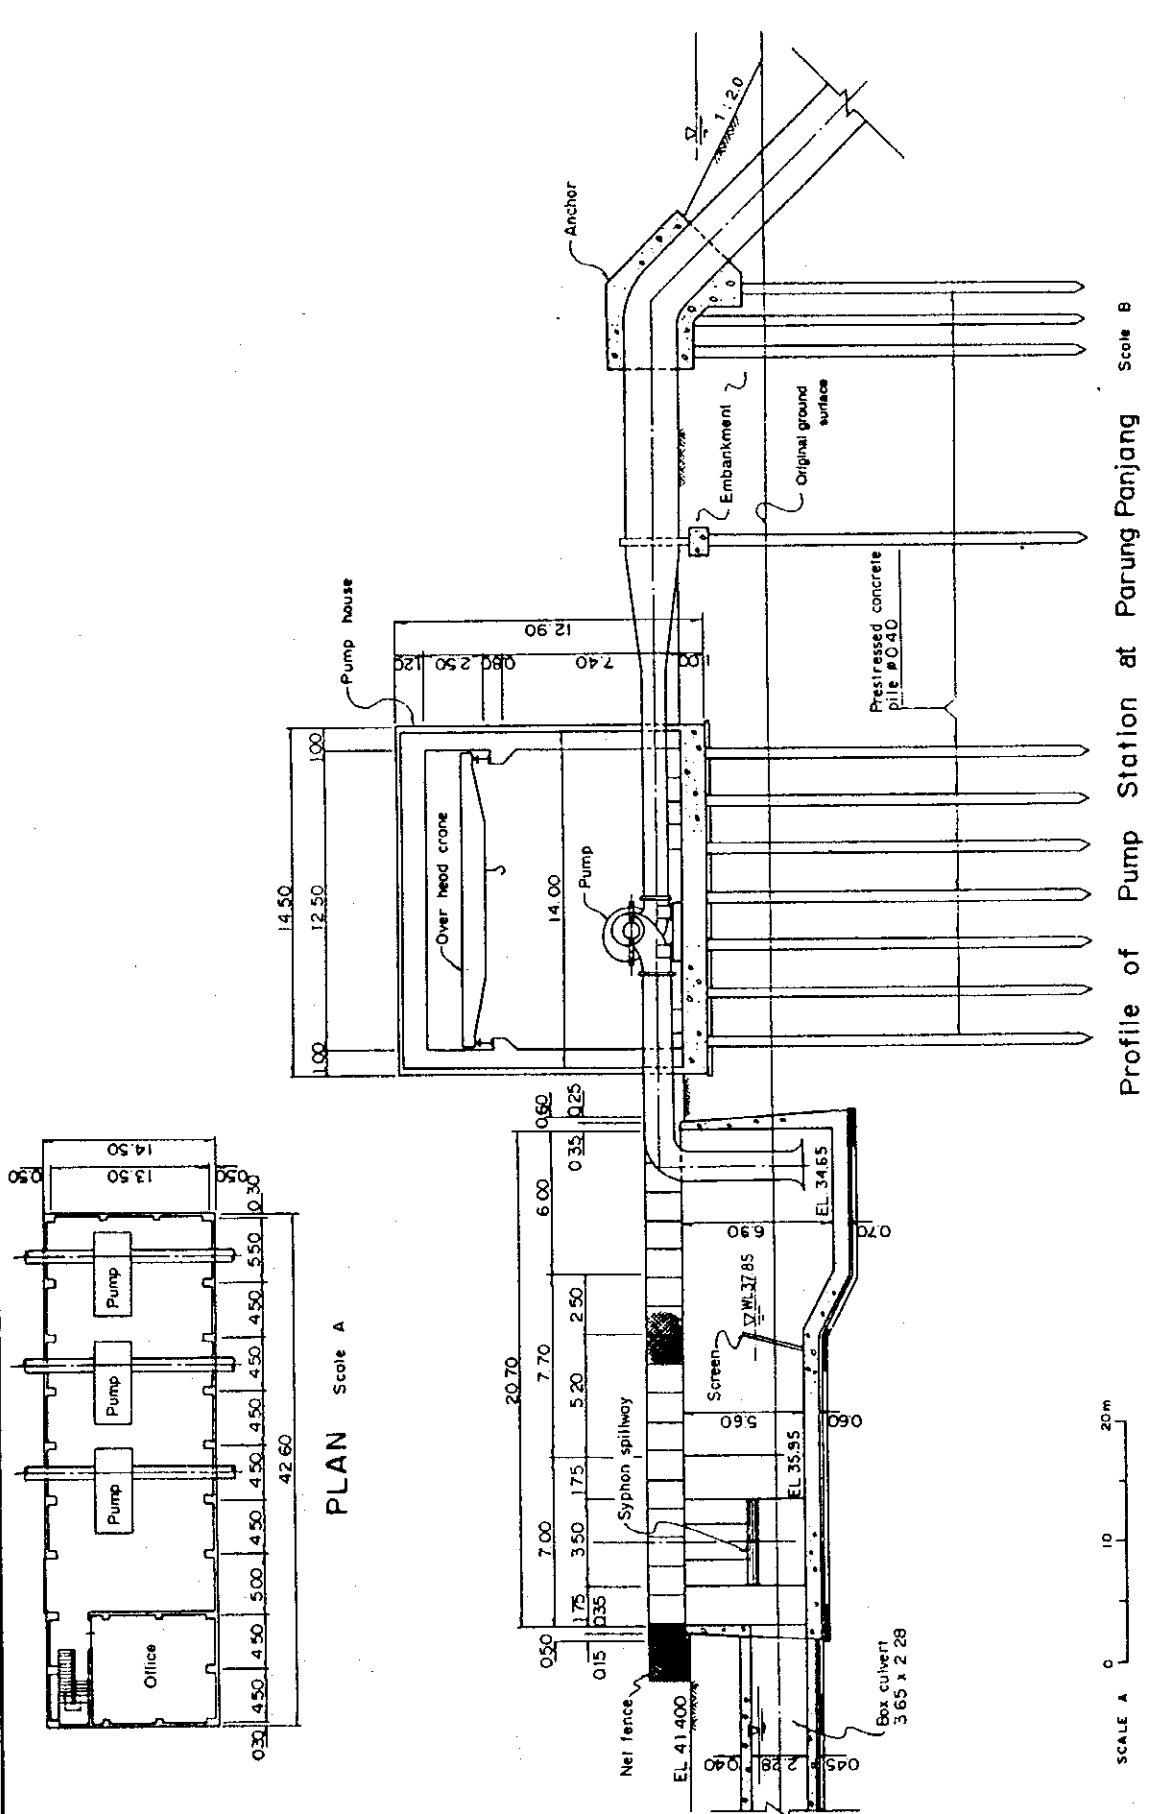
PLAN AND PROFILE OF PUMP STATION AT PARUNG PANJANG
